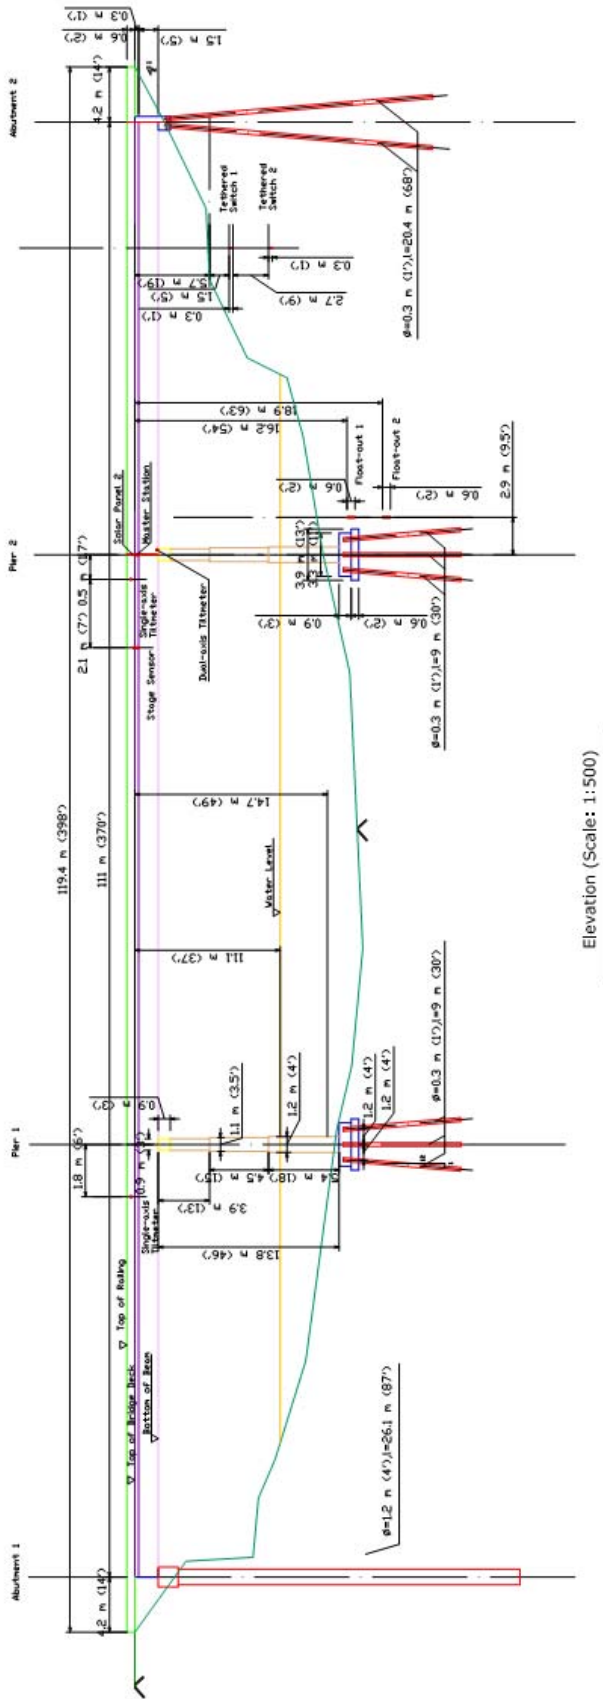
Layout of US59 over Guadalupe River Bridge.
